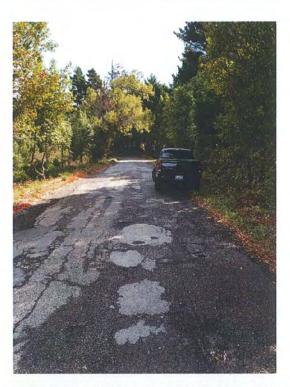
RP 5. Typical section of Chambers Rd (County maintained. State Road No.: 2D020). Vehicle traveling east, photo taken facing east.
